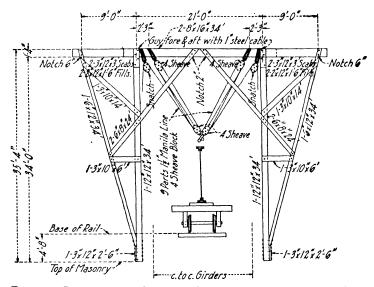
DETAILS OF A GALLOWS FRAME. AMERICAN BRIDGE COMPANY.
